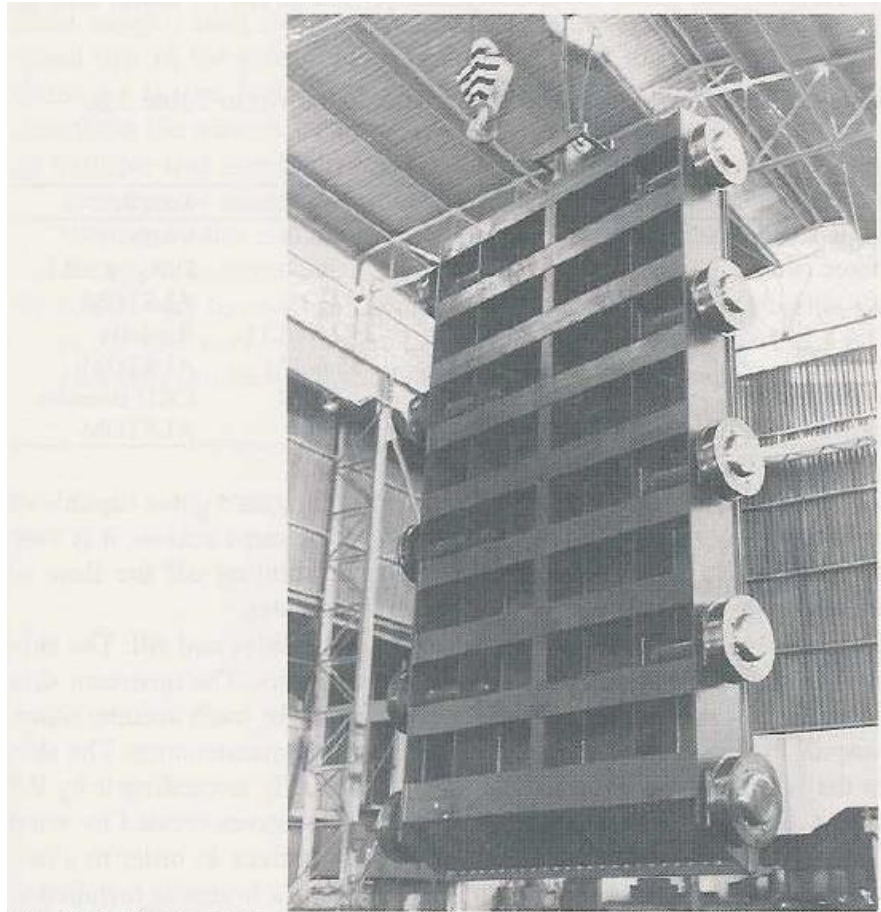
Fixed-wheel gate for the bottom outlet of the Passo Real Power Plant
